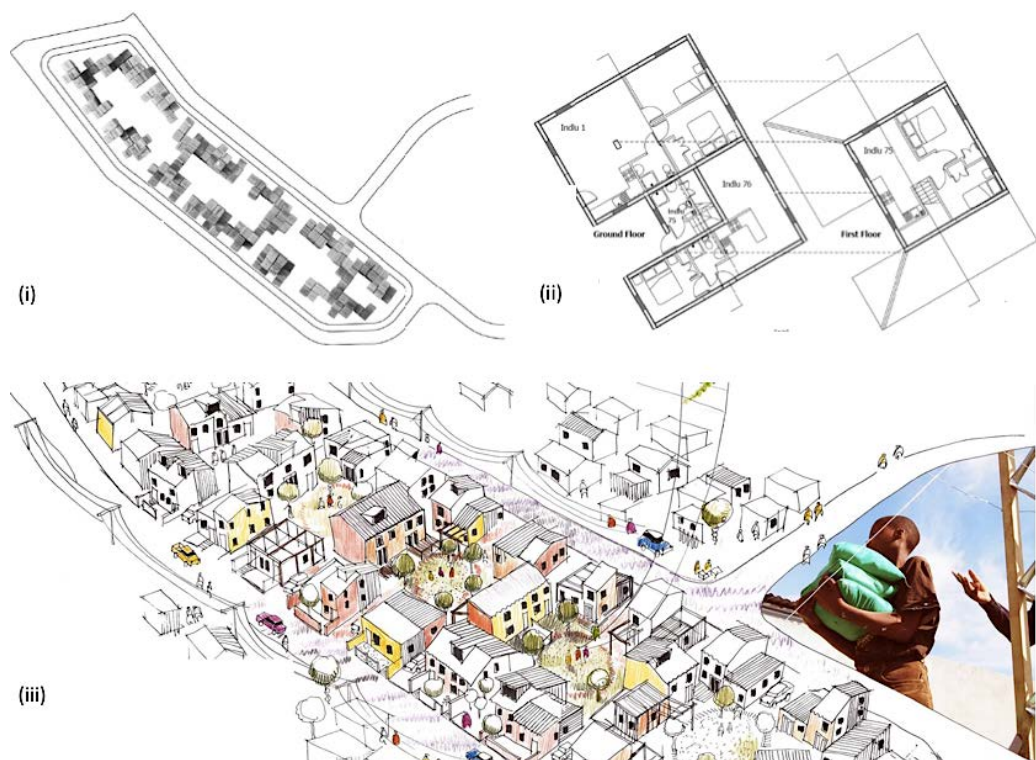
The (i) site layout concept, (ii) individual dwelling layouts, and (iii) a perspective drawing of the proposed upgrading. Drawings: UBU (2012: 9; 12-13)
